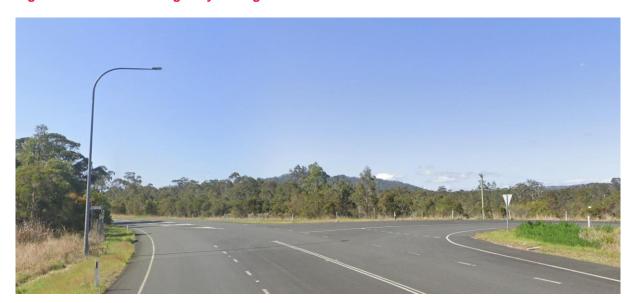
Booral Road Facing East Towards Old Pacific Highway Intersection
